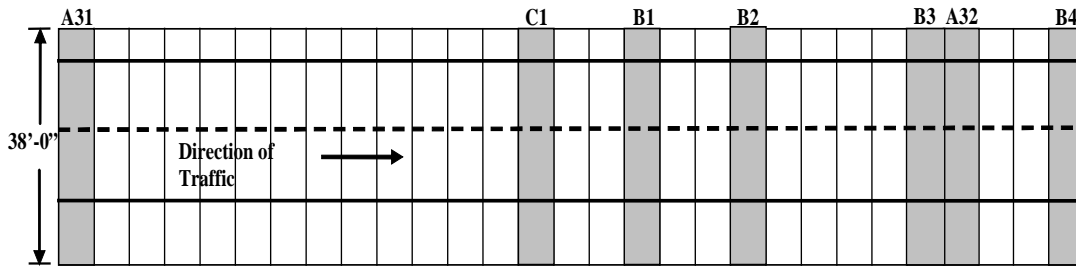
Overall view of test-section and location of instrumented panels (A refers to a joint panel, B refers to a base panel, and C refers to a anchor panel)
